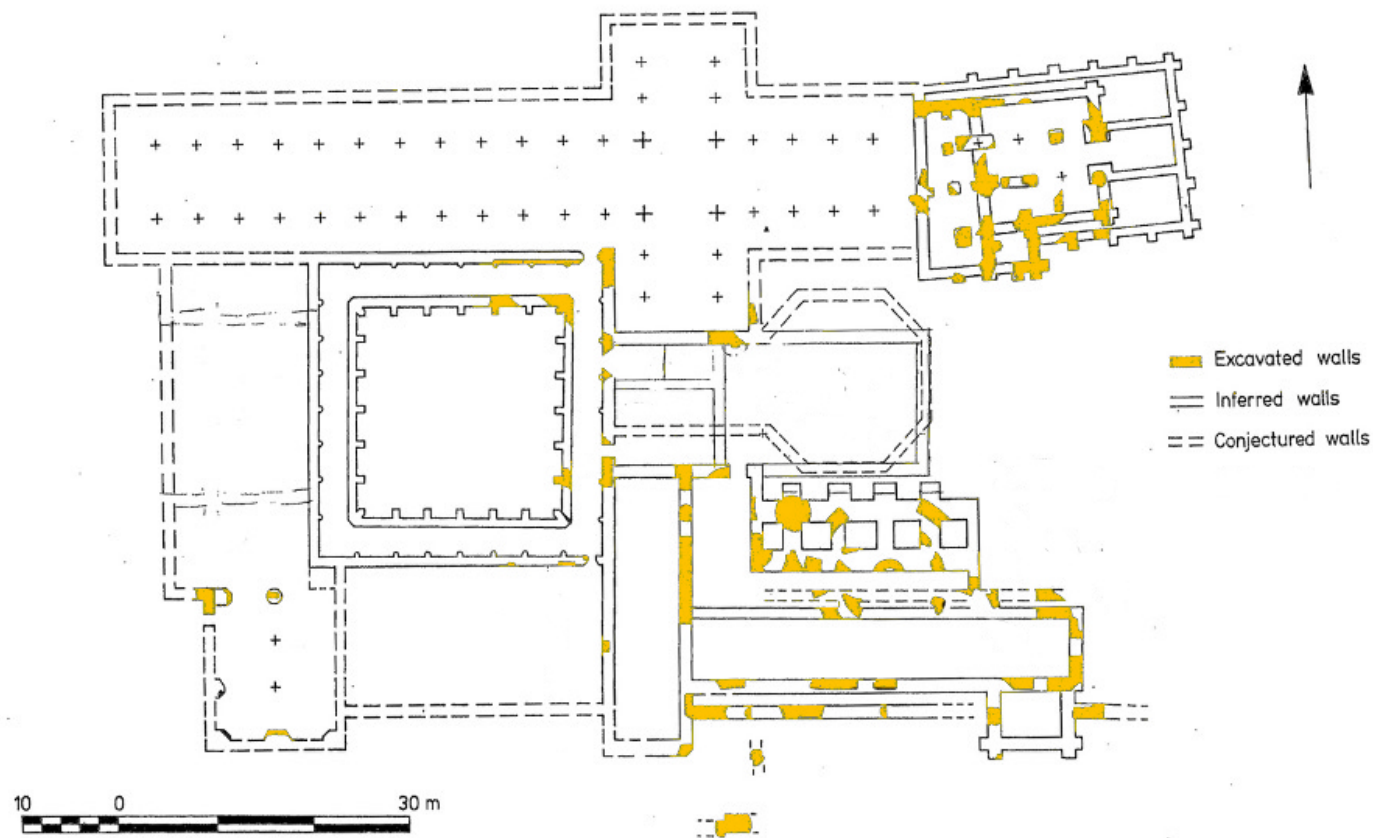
Proposed plan of the abbey showing a potential plan of the east range (Harris, 1997, 9), with excavated walls highlighted. © English Heritage.
